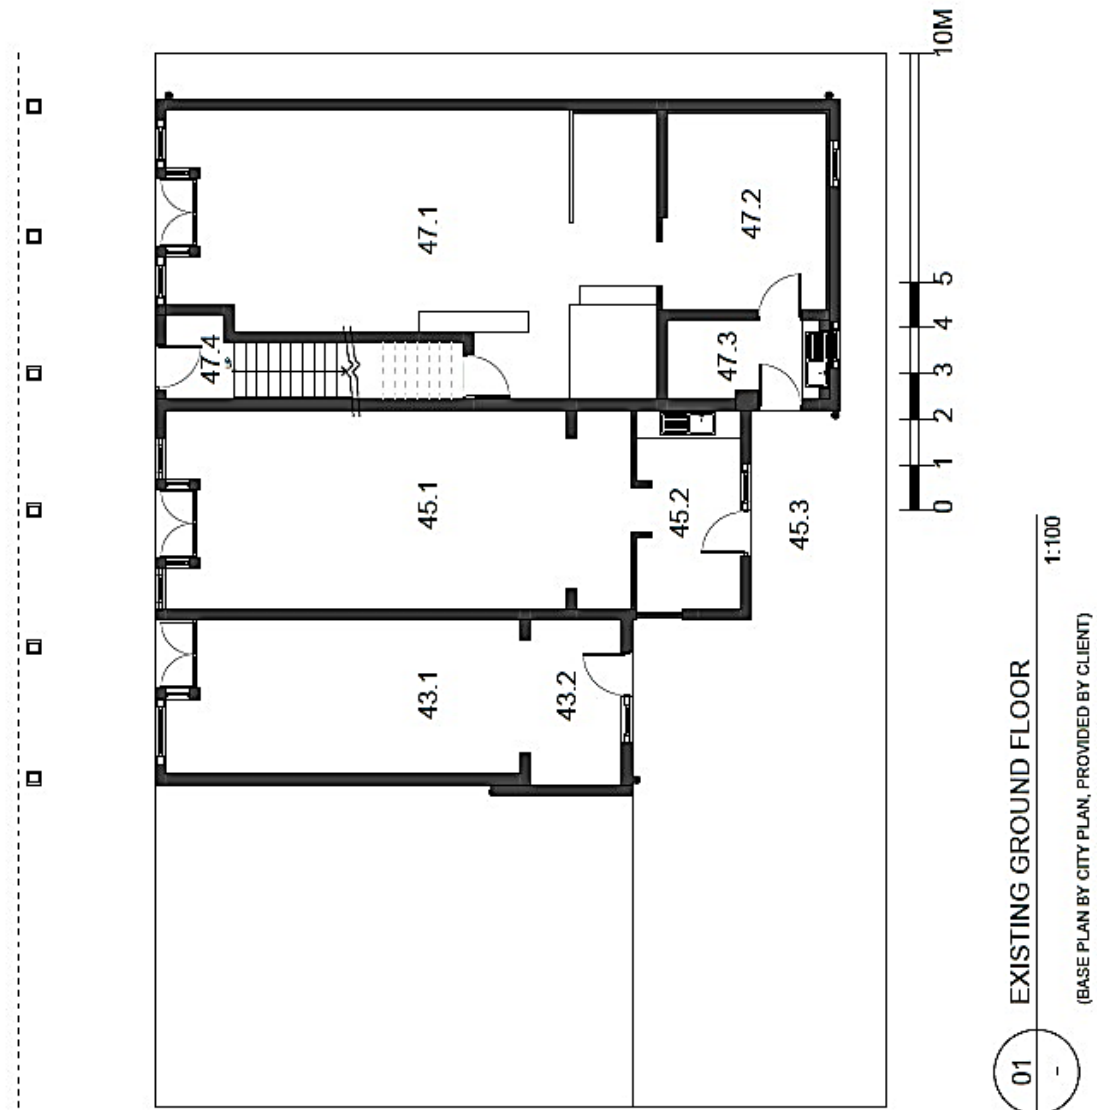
Existing ground floor plan of George Street Shops. Source: City Plan via Sydney Metro, April 2022. Room numbering by OCP Architects.
